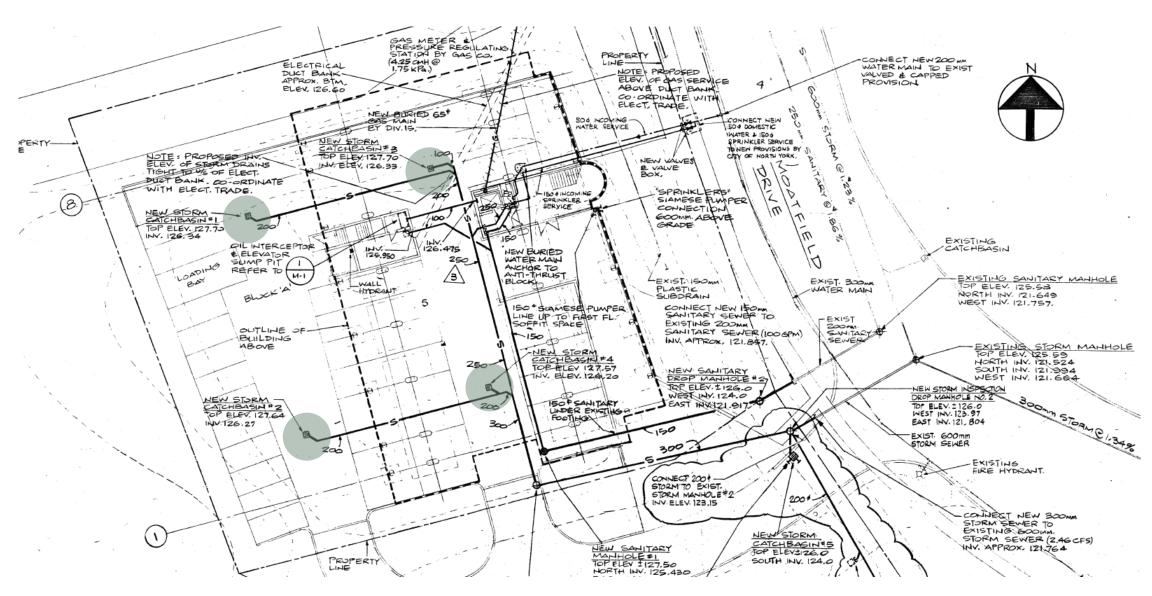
excerpt from original mechanical site plan site servicing drawing (1991) showing the locations of key catch basins
